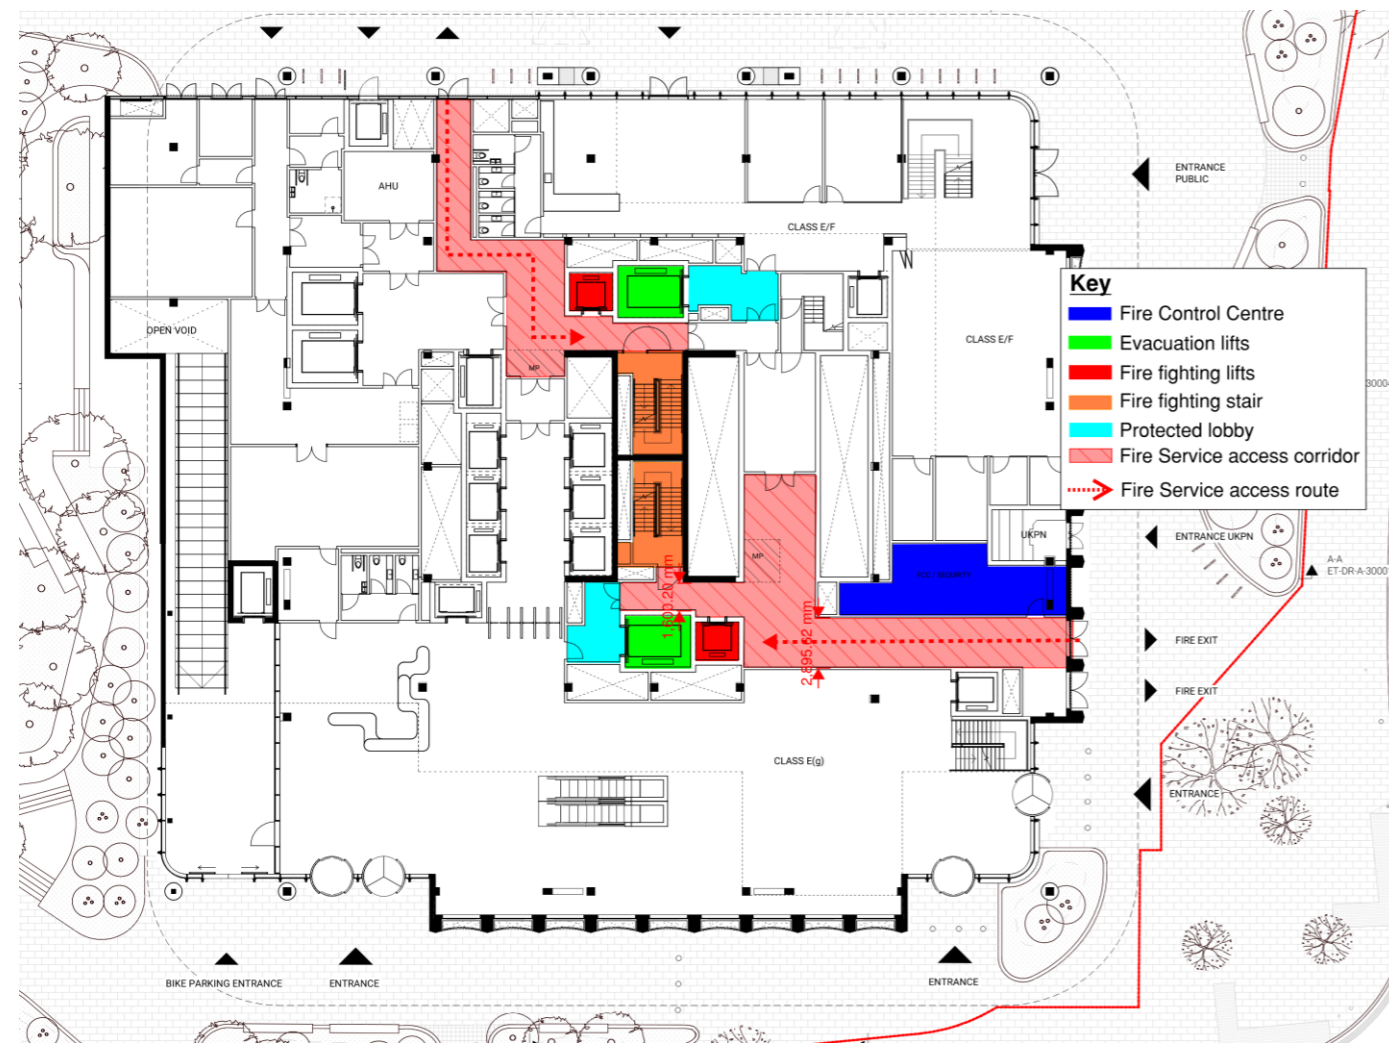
Firefighting facilities provided within the building. Ground Floor access presented.
